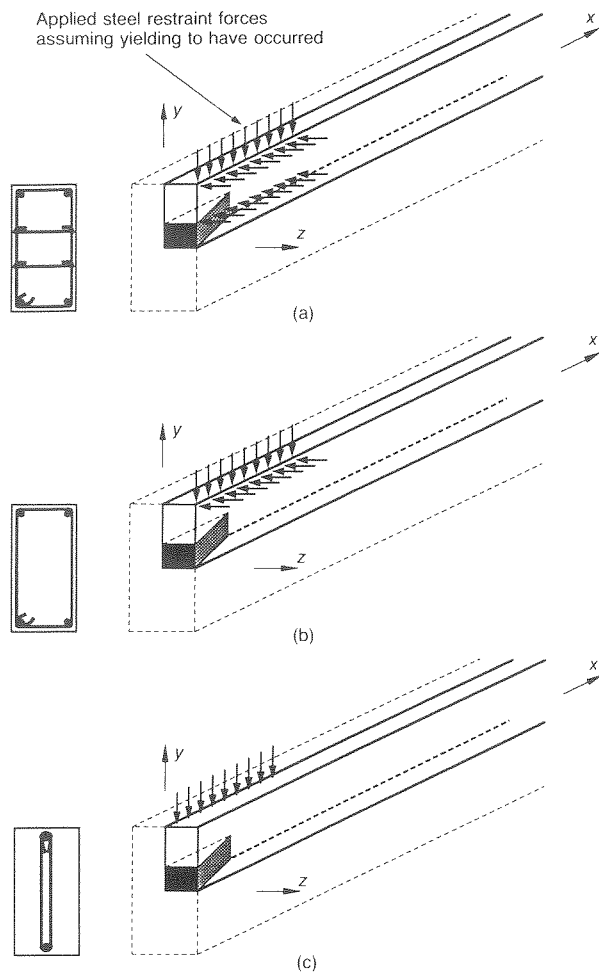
Models for third-direction failure under various steel arrangements: (a) cross-linked stirrups; (b) no cross-links; (c) central steel
